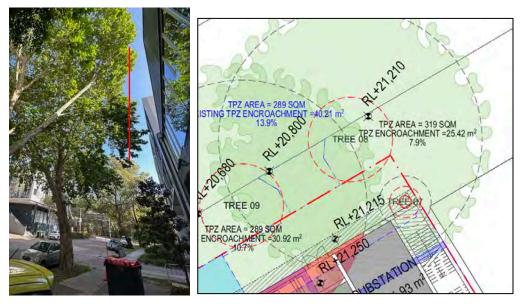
& 58: The proposed pruning requirements to accommodate the proposed building façade next to Tree 5. (Source: Austin 2nd November 2023).
